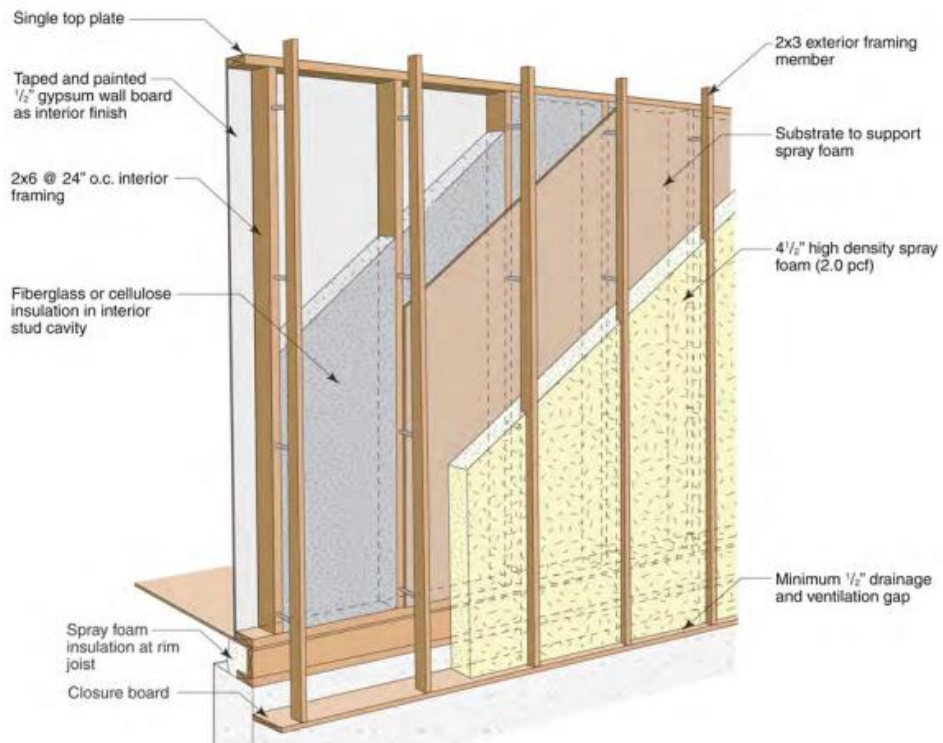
Off-set wall system (Straube and Smegal, 2009)
